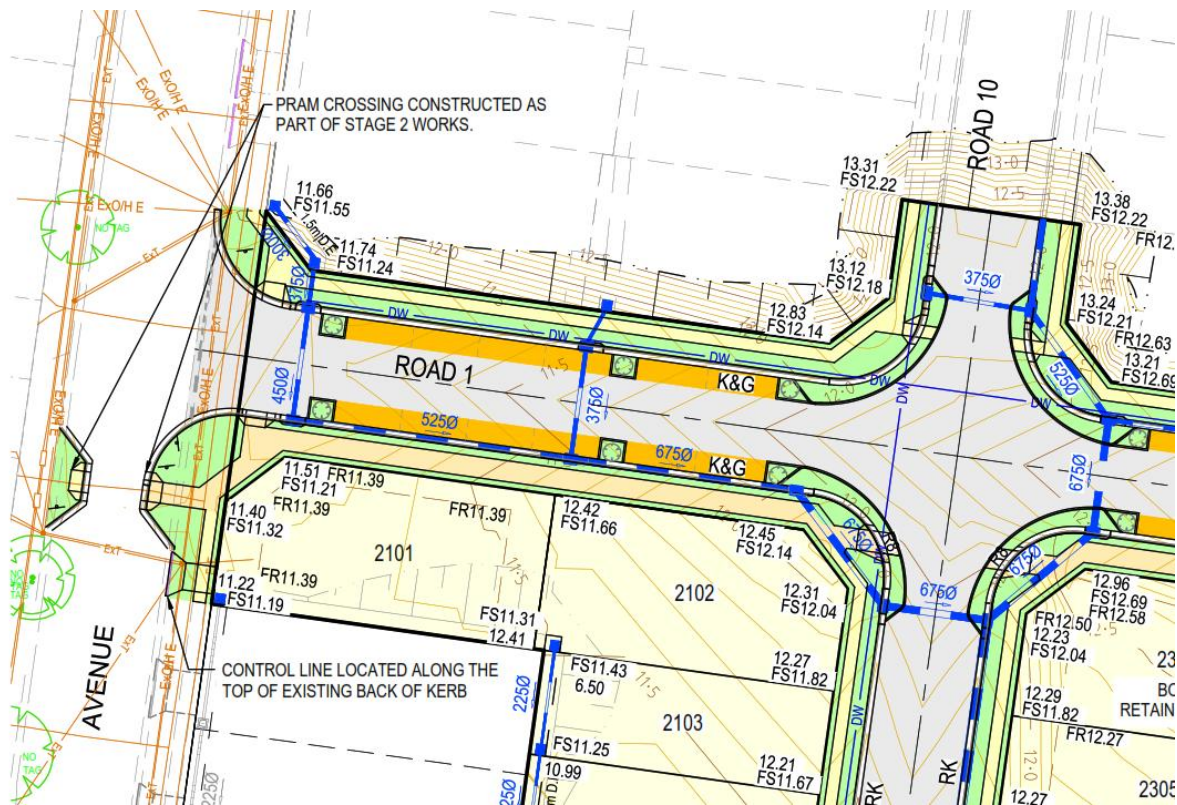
Excerpt Layout Plan Stage 2 Sheet 1 of 2, showing proposed new site access to Ashford Avenue.
